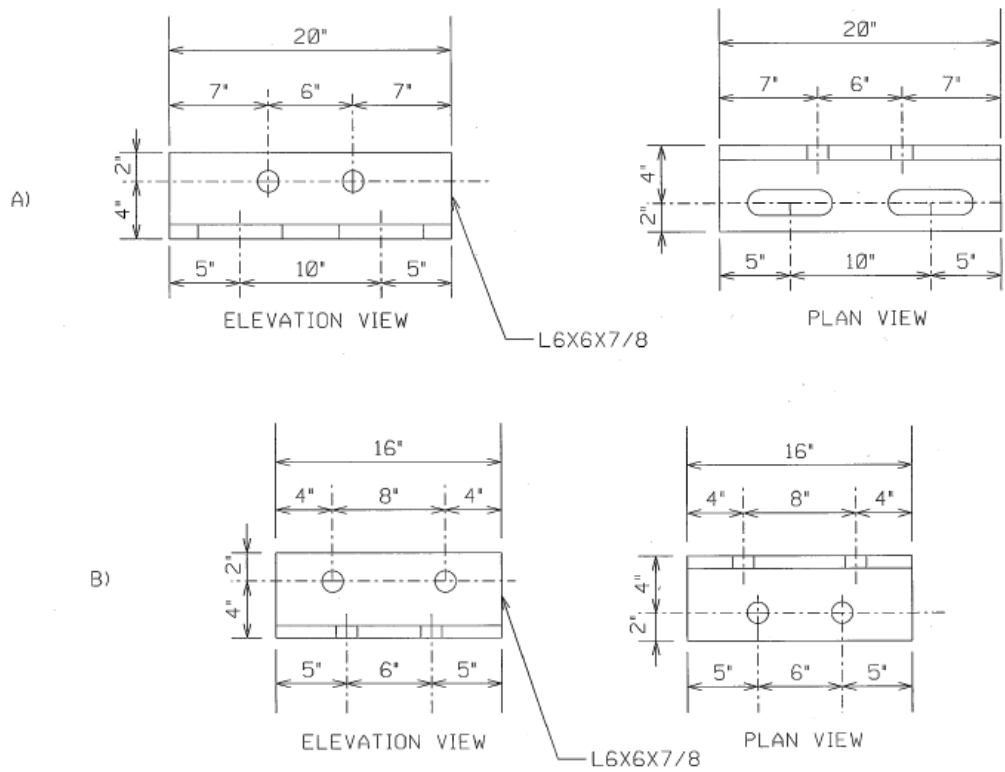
Oseligee Creek Bridge Bent 2 & 3 Connections
